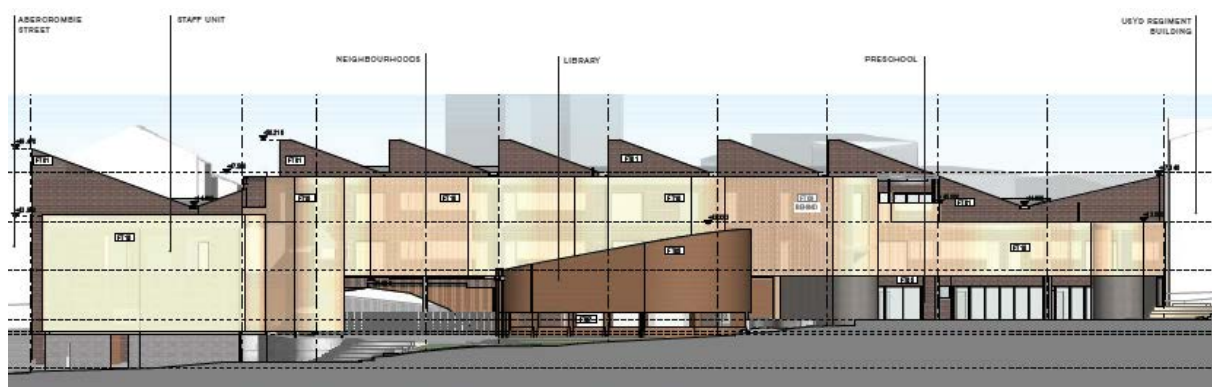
Eastern (internal) elevation, facing the school grounds. (Source: FJMT, April 2020)
